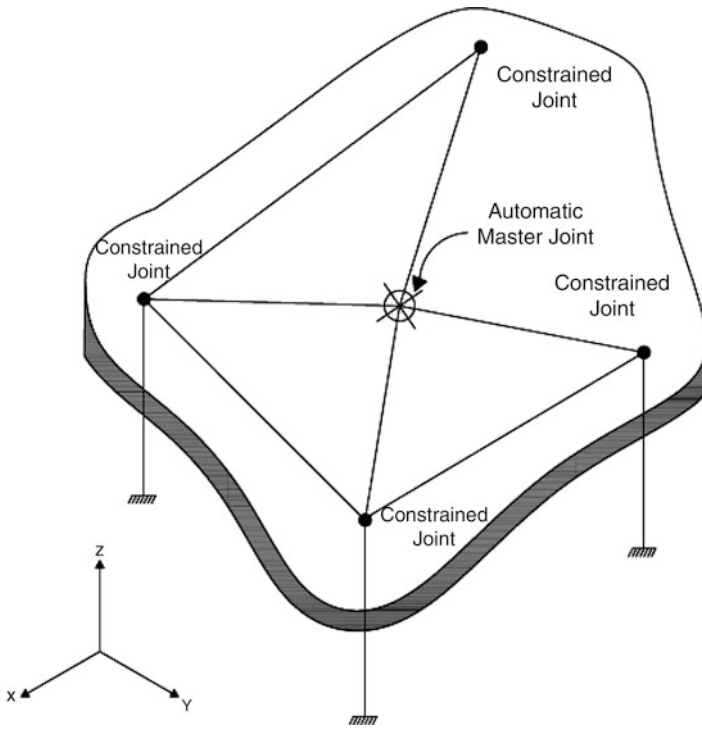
Use of diaphragm constraint to model a rigid floor slab
